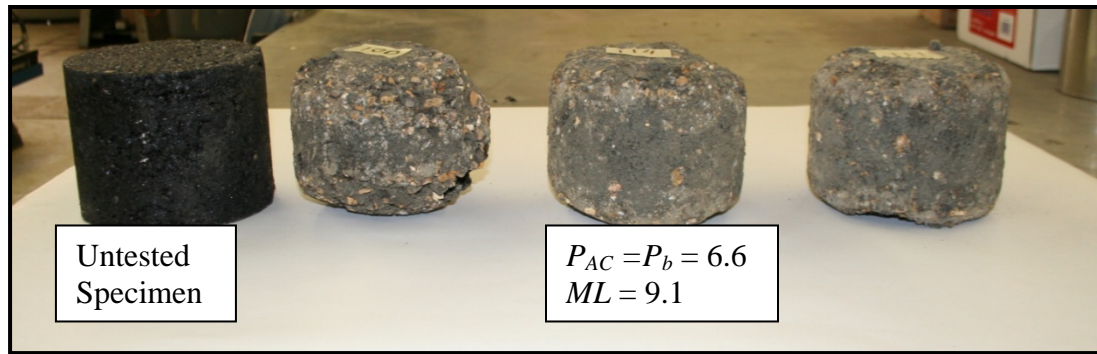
Tested Cantabro Specimens with Varying Total Asphalt Content (P_{AC})
